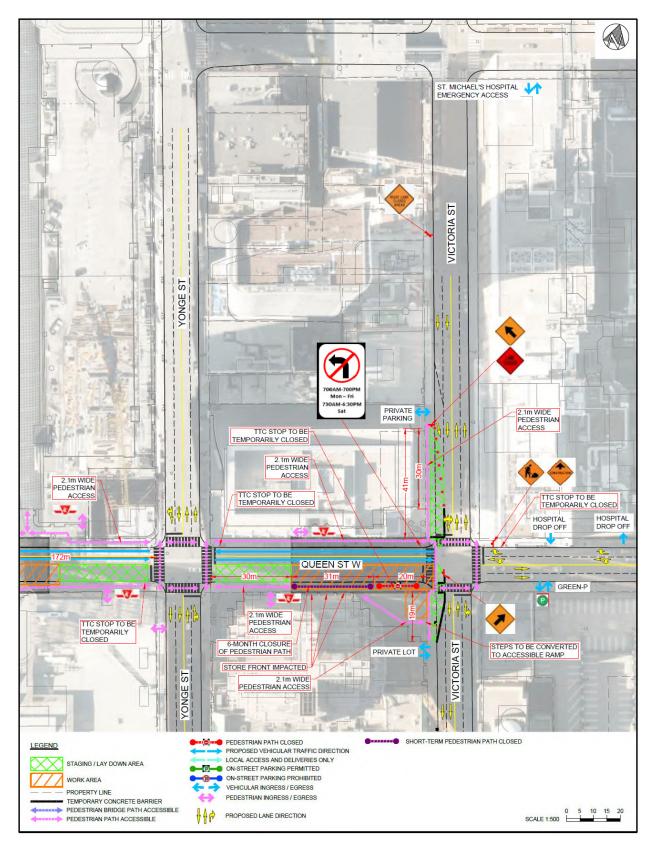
Partial Queen Street Closure (South Construction) - Traffic Staging Plan
